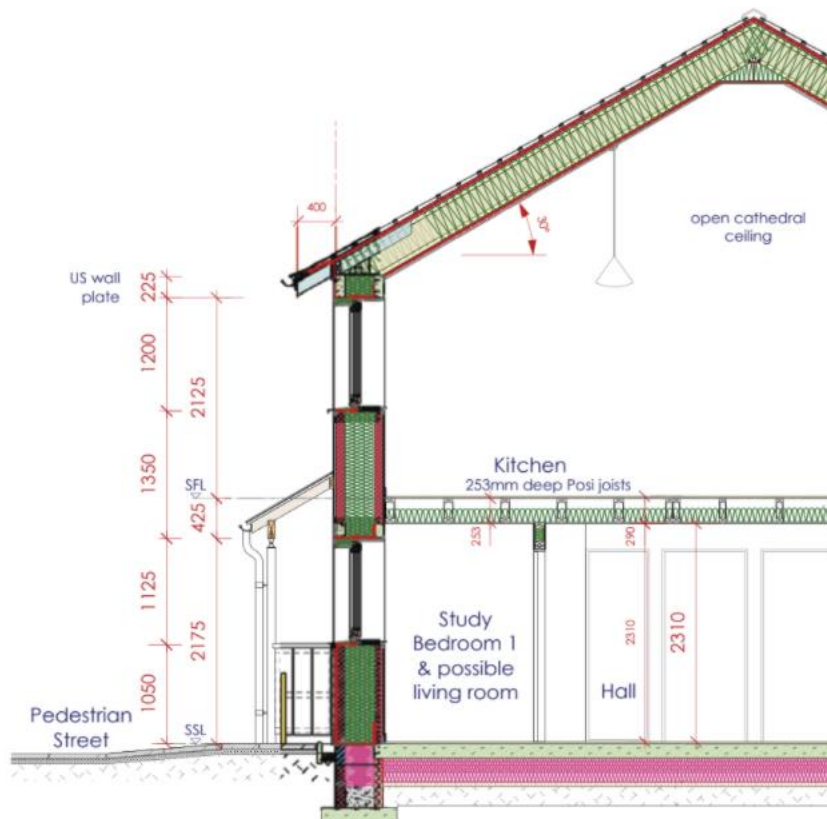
section of resident dwelling - wall and ceiling structure (Eco arc)
